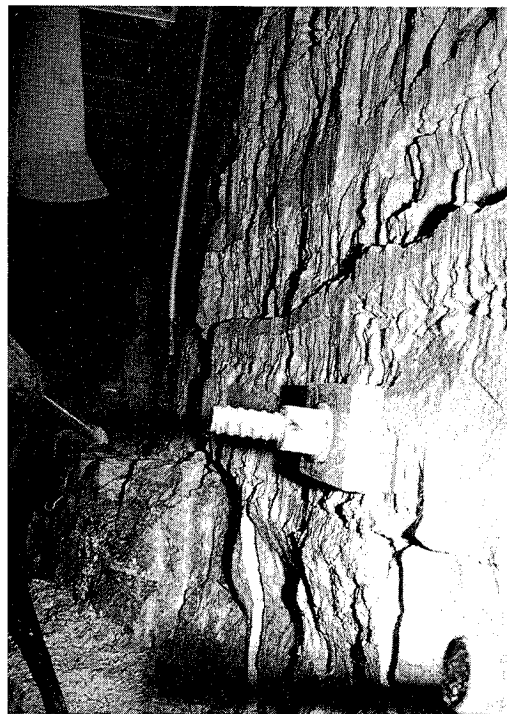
Bolt Installation in a Waterjet Cut Wall.
